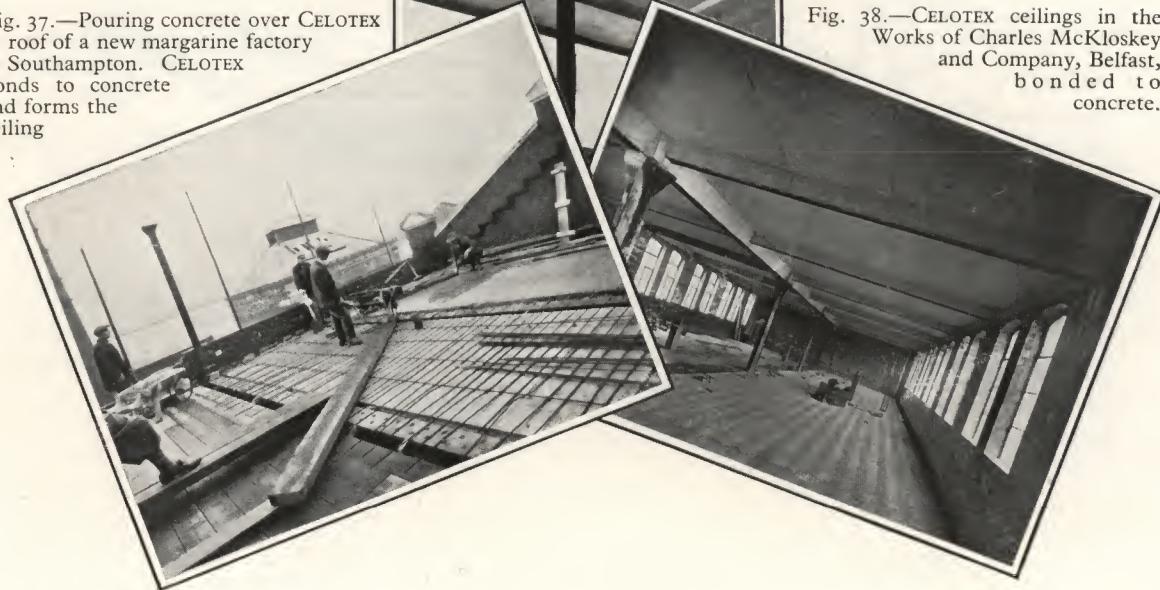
CELOTEX ceilings in the Works of Charles McKloskey and Company, Belfast, bonded to concrete.
